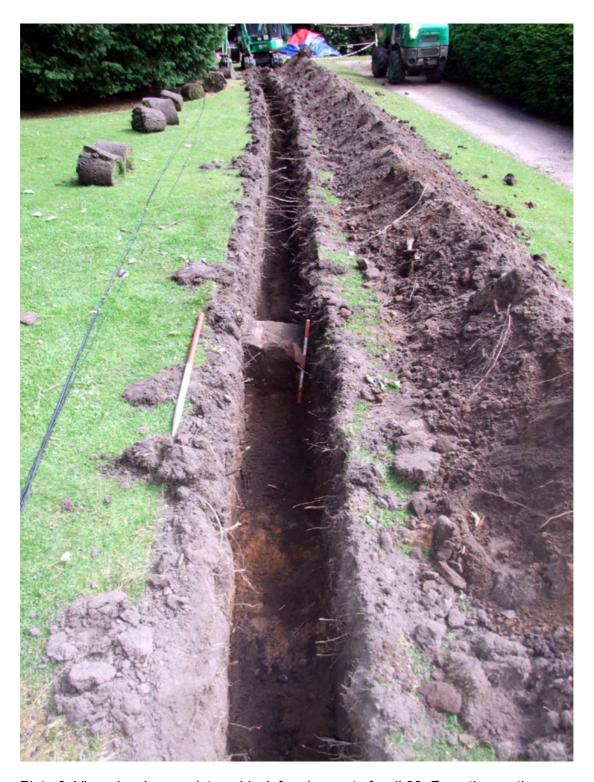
View showing sandstone block forming part of wall 38. From the south.
